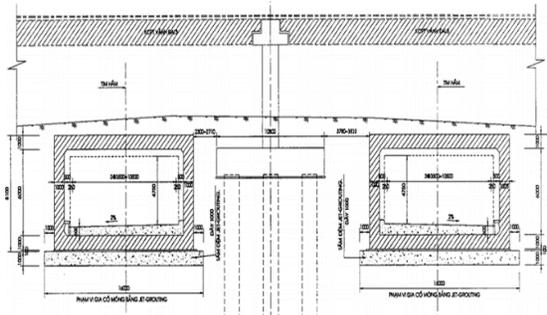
Schematic diagram of the Hanoi Trung Hoa tunnel
